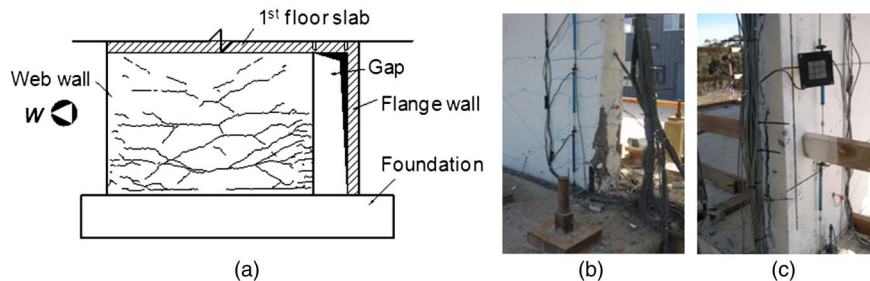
Observed damage of web wall after test EQ4: (a) south side view of web wall—Level 1; (b) west bottom end of web wall at Level 1; (c) west bottom end of web wall above first-floor slab
